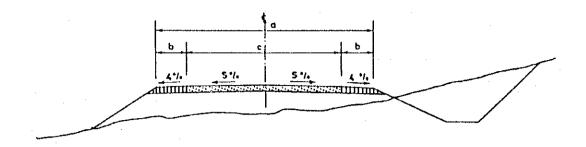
Cross Section Type II-VIII-Single Carriage Way
